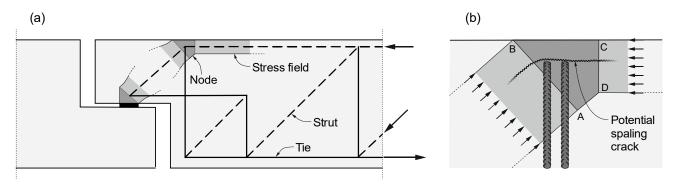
Dapped-end beams: (a) typical geometry with strut-and-tie model for orthogonal reinforcement and (b) detail of the nodal area on top of the hanger reinforcement.
